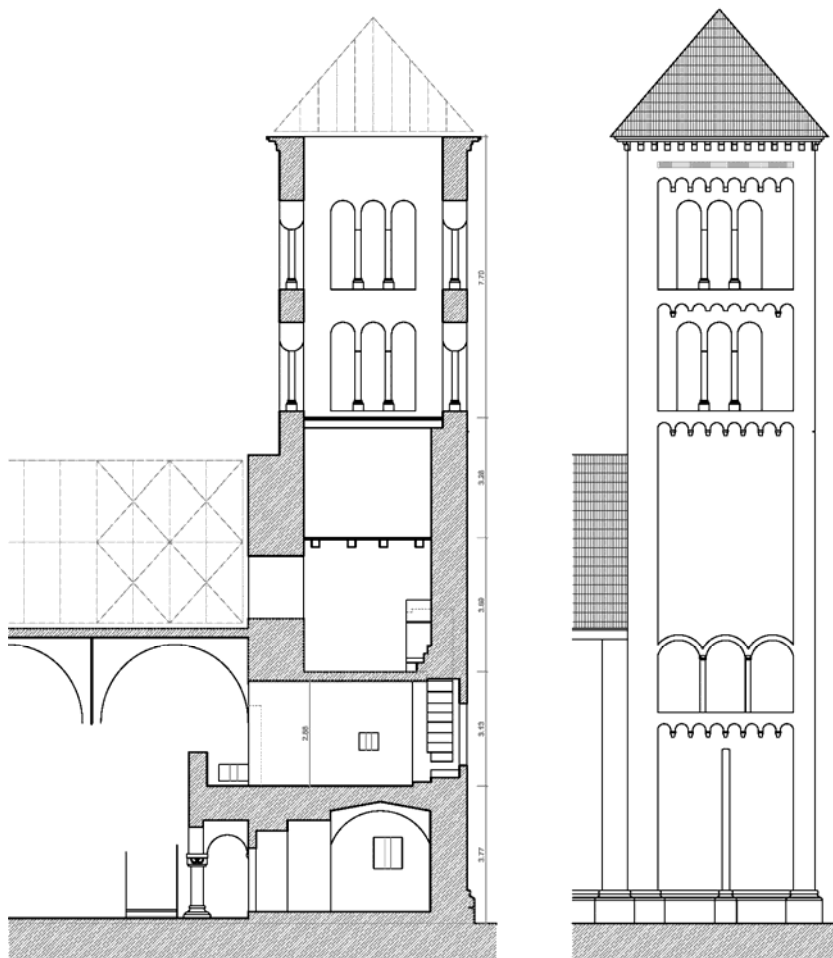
Longitudinal section & north elevation, CAD drawing. Pablo Bañasco, 2018.
